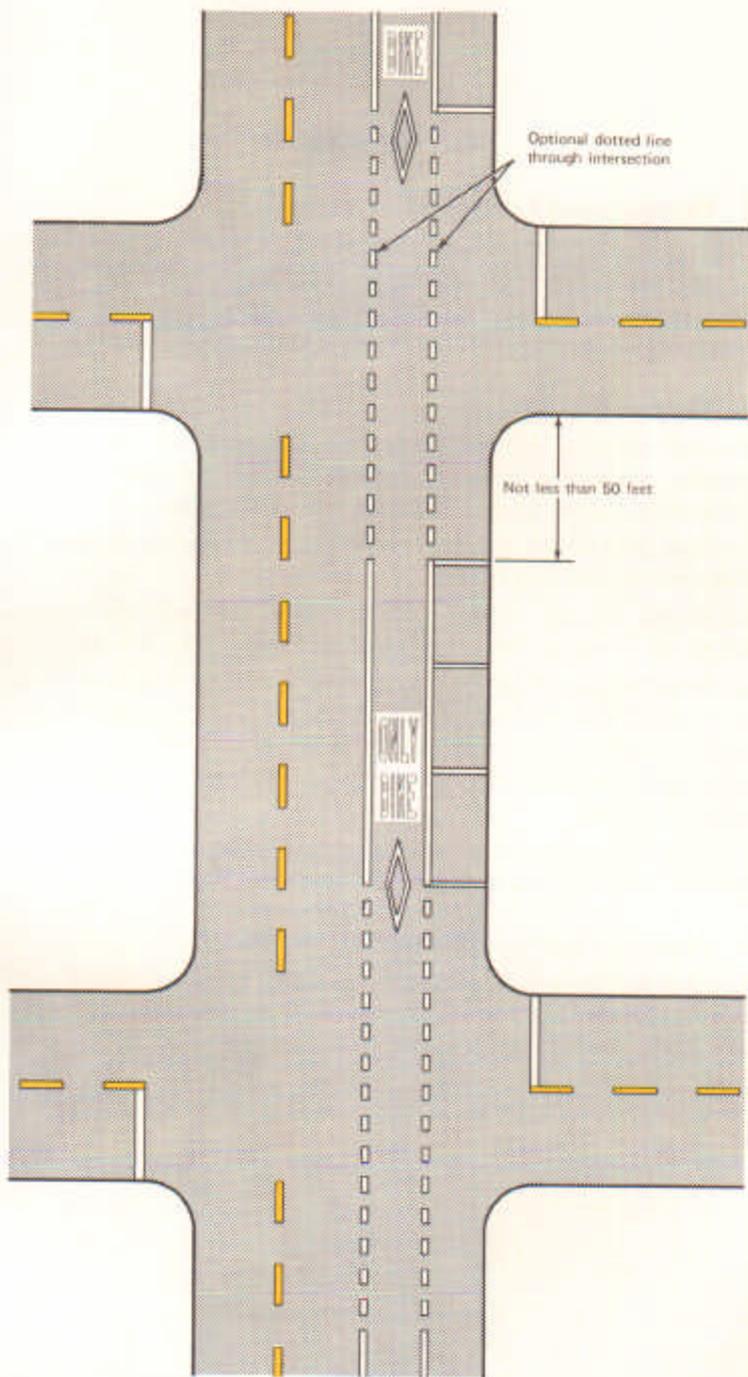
Typical pavement markings—designated bicycle lane, two-way traffic with parking and low right turn volume.
